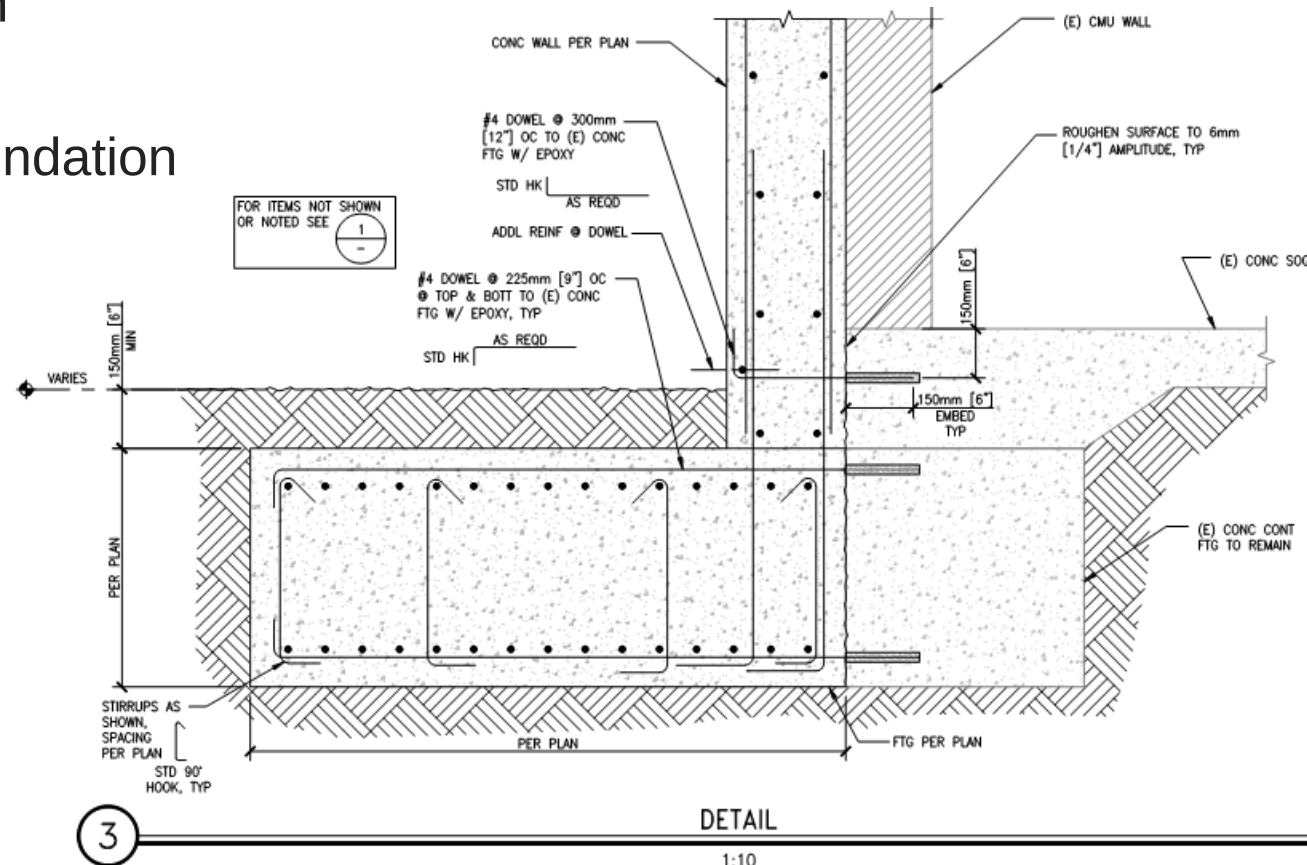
DETAILS REFERENCED IN FOUNDATION PLAN CONT.
